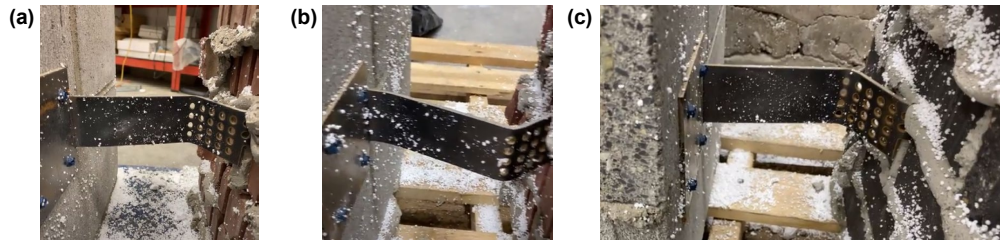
Plated connector with an upright orientation illustrations of (a) typical buckling of clay brick veneer specimens, (b) unique C-PV.CL-2 buckling in opposite direction, (c) typical buckling of concrete brick veneer specimens
